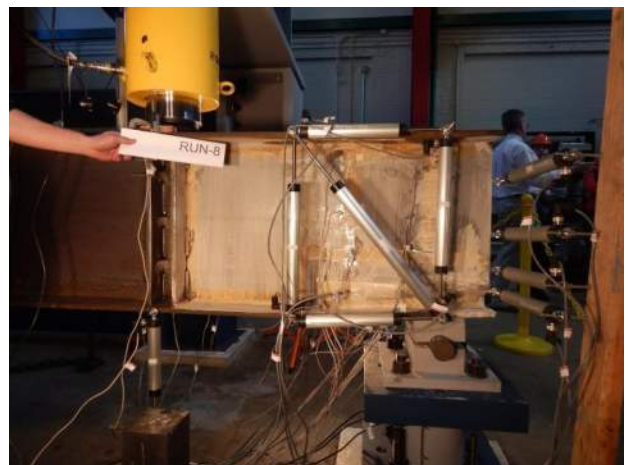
Damaged Girder Left: +0.50 in
